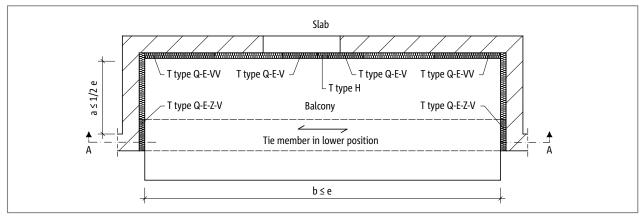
Schöck Isokorb® T type Q-E-Z-V: Layout of recessed balcony - symmetrical
